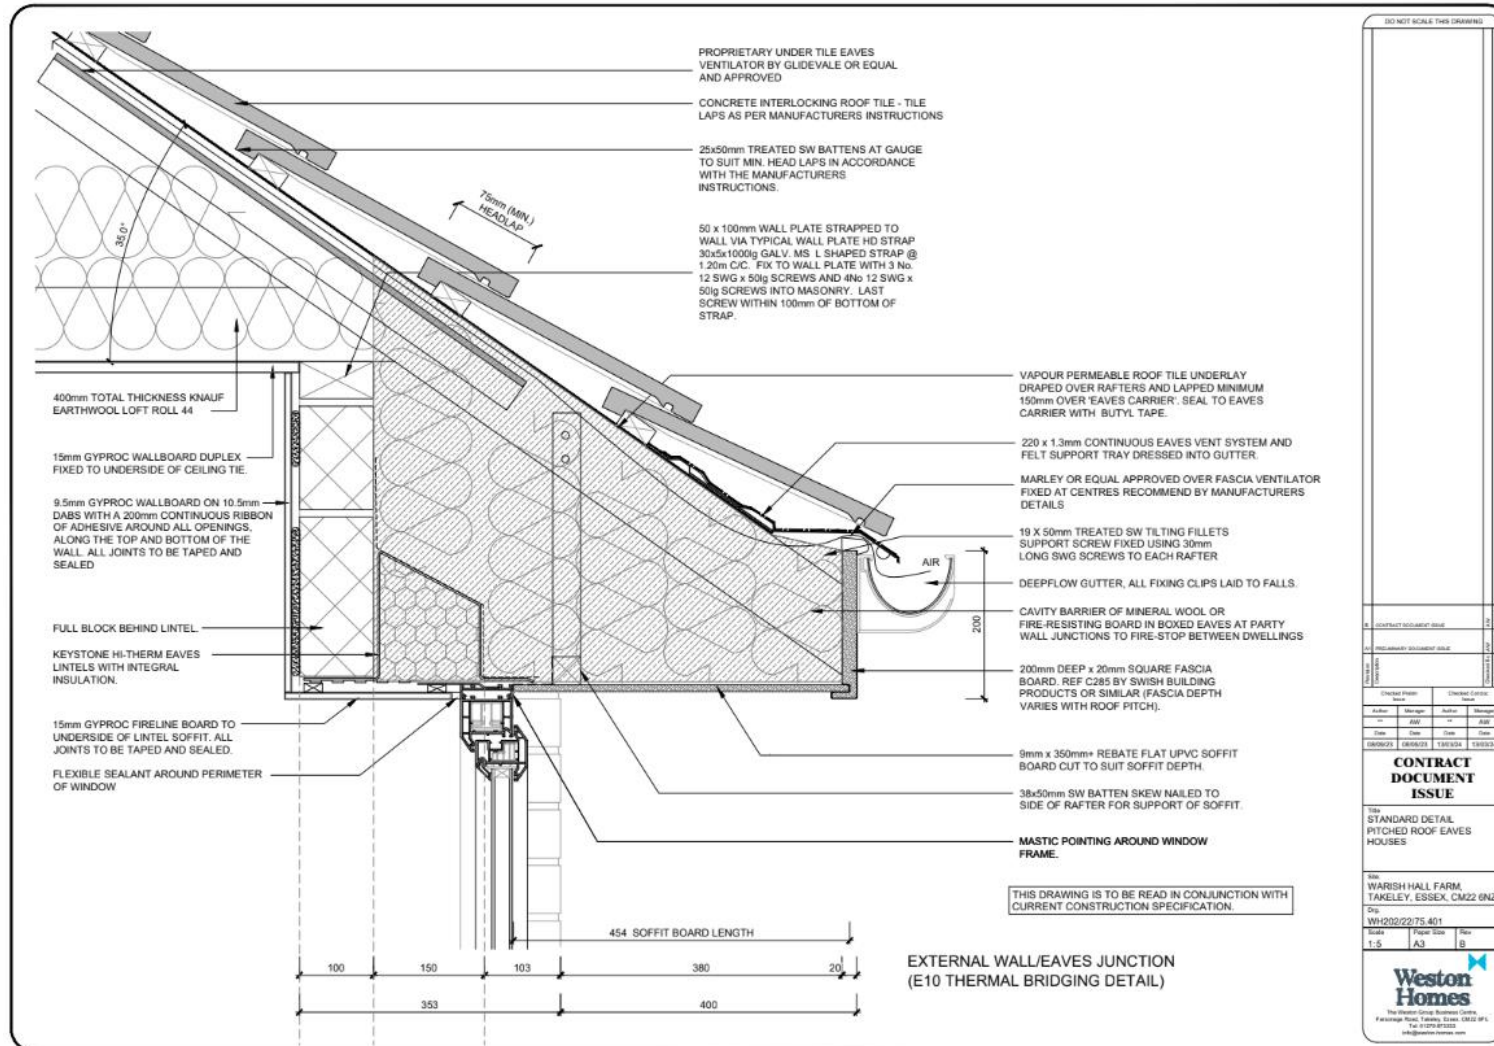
Roof Construction Drawing WH202/22/75.401 – Jacks Lane
